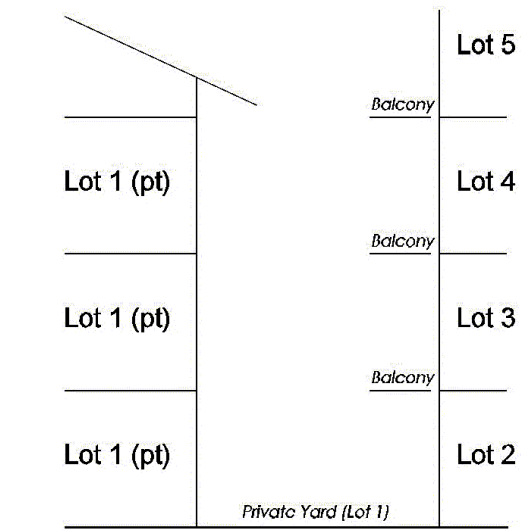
Private Yard unacceptable. Lots in building do not satisfy a low rise building.
